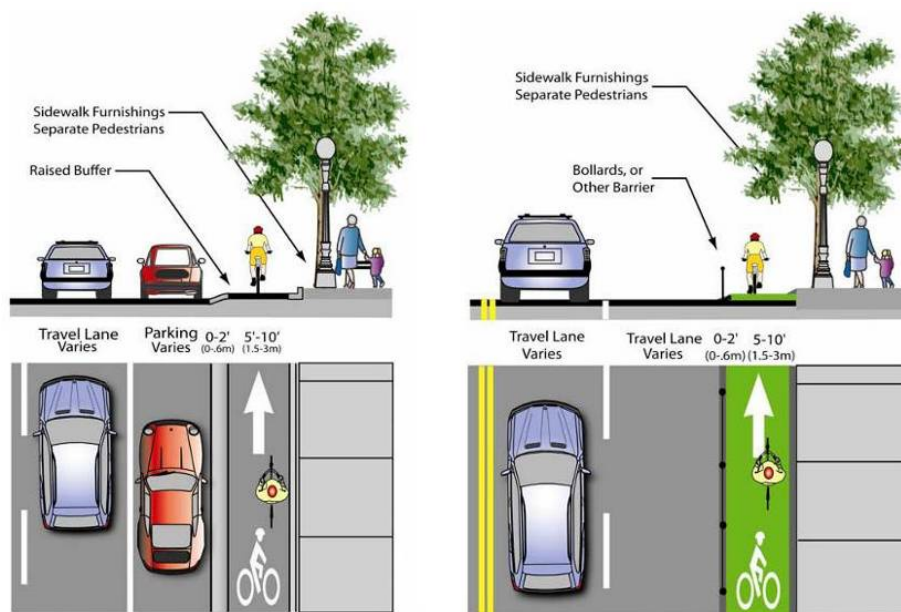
Typical Cycle Track With or Without On-Street Parking
